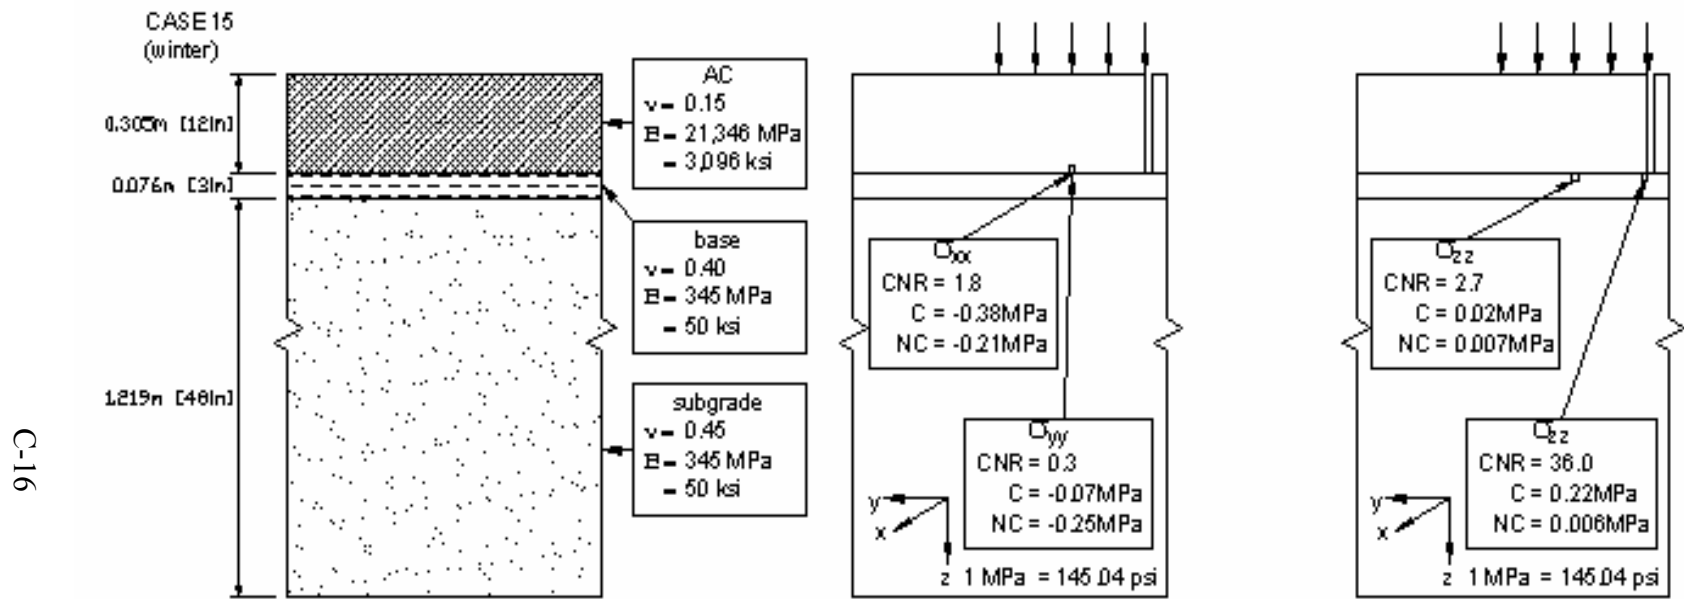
Summary cross section for case 15, (C – stress in cracked pavement, NC – stress in pavement with no crack, CNR – crack/no crack (stress) ratio)
